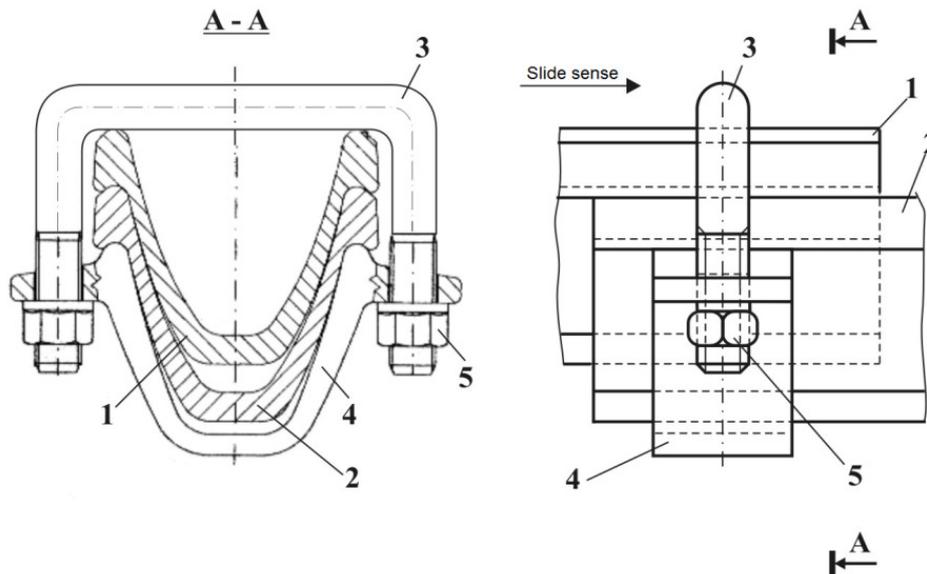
Metal construction supporting the new improved form: 1,2-laminated profiles, superior (beams) and lower (pillar); 3- round neck of tightening and joining the clamp; 4- lower flat clamp; 5- the nut threaded neck of clamp
